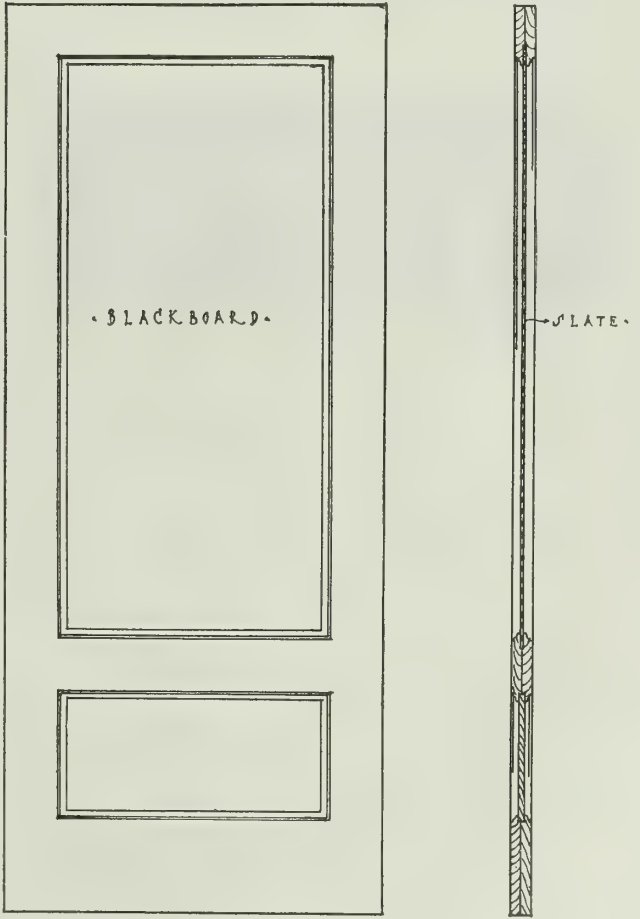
DETAIL OF SLATE PANEL IN DOOR
